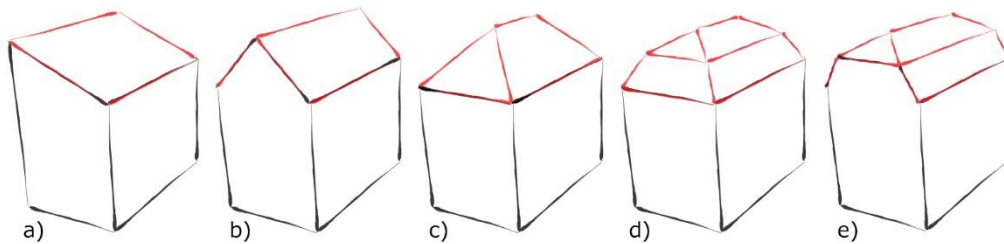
Roof shapes (a) shed or lean-to roof; b) gable roof; c) hipped roof; d) gambrel roof; e) jerkinhead roof)
